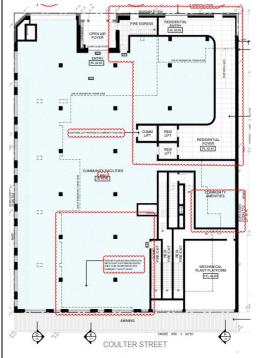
Extract of ground floor plan showing increased community floor space (m2) including revised layout and new residential entry off Western Crescent (Source:
